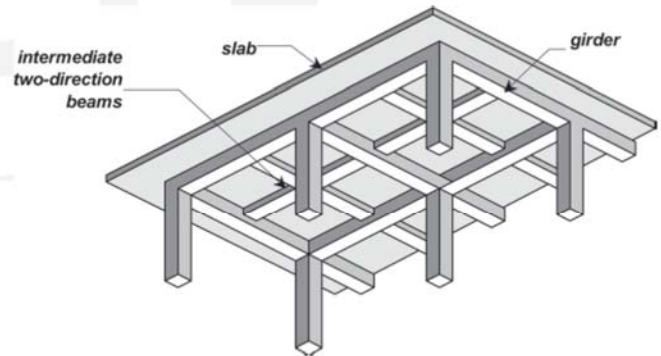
Use of two-direction intermediate beams in the slab-on-girder floor system.
